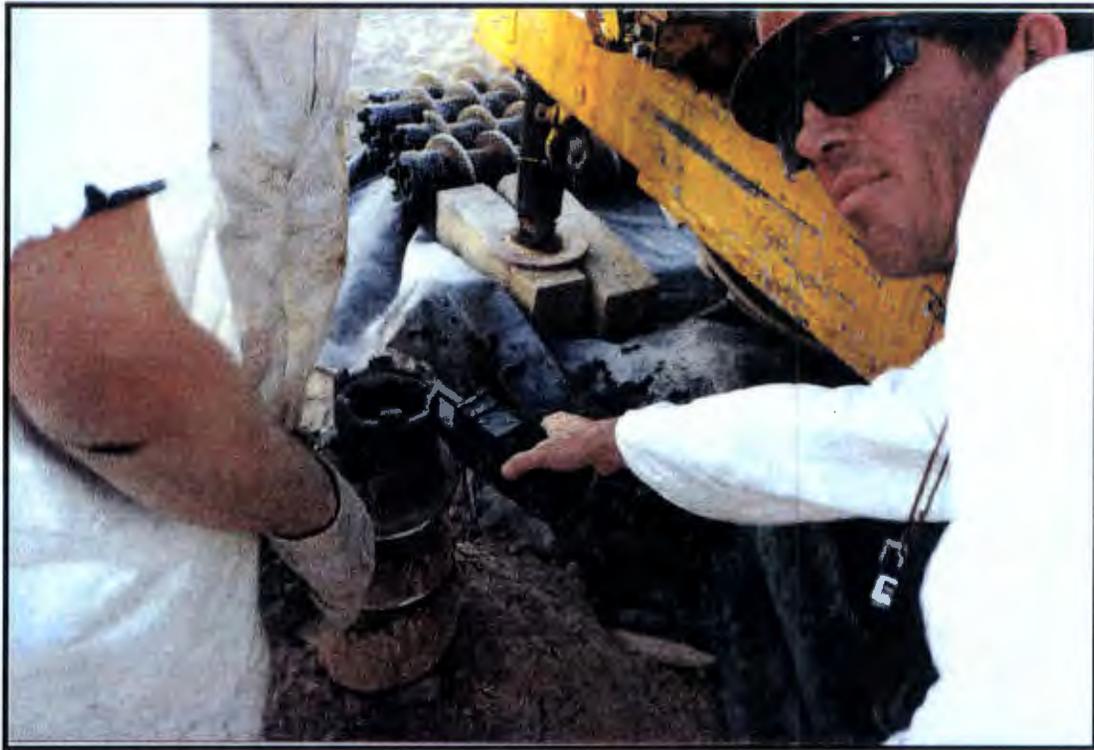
Drilling Apparatus (CME 750 ATV Hollow Stem Auger).
